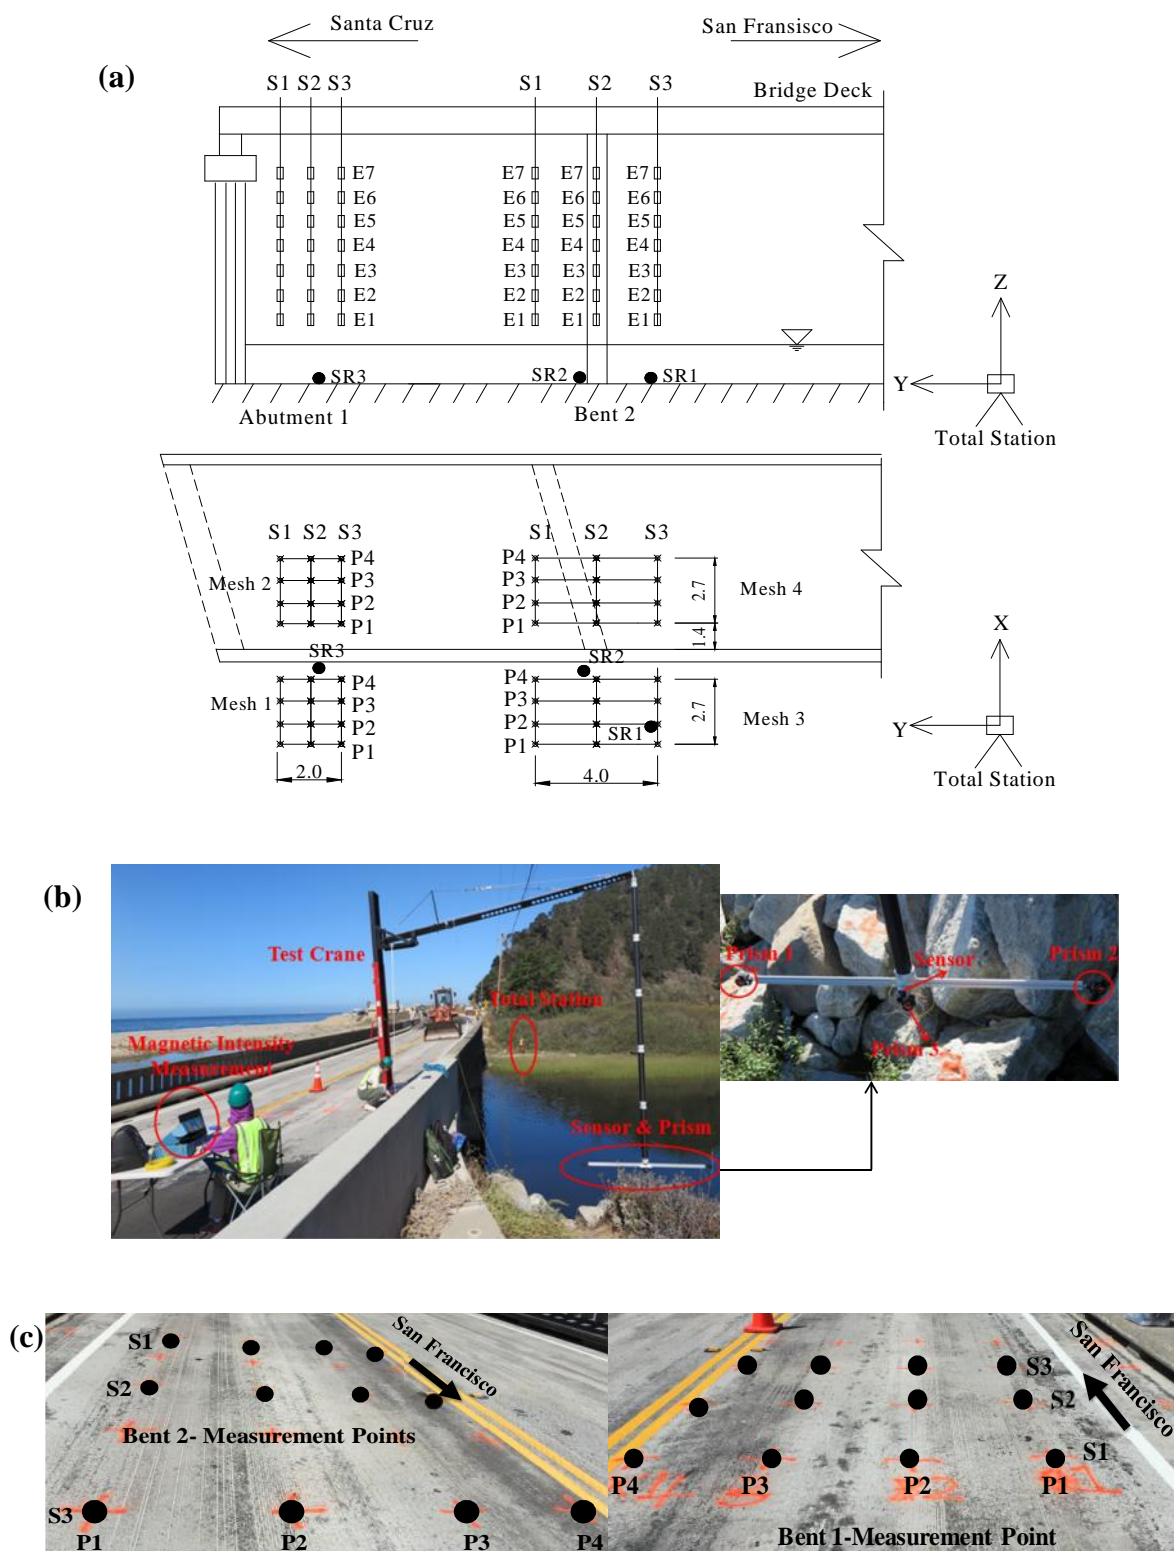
Waddell Creek bridge – first series of tests: (a) planning (unit: m), (b) test setup, and (c) forklift positions.
